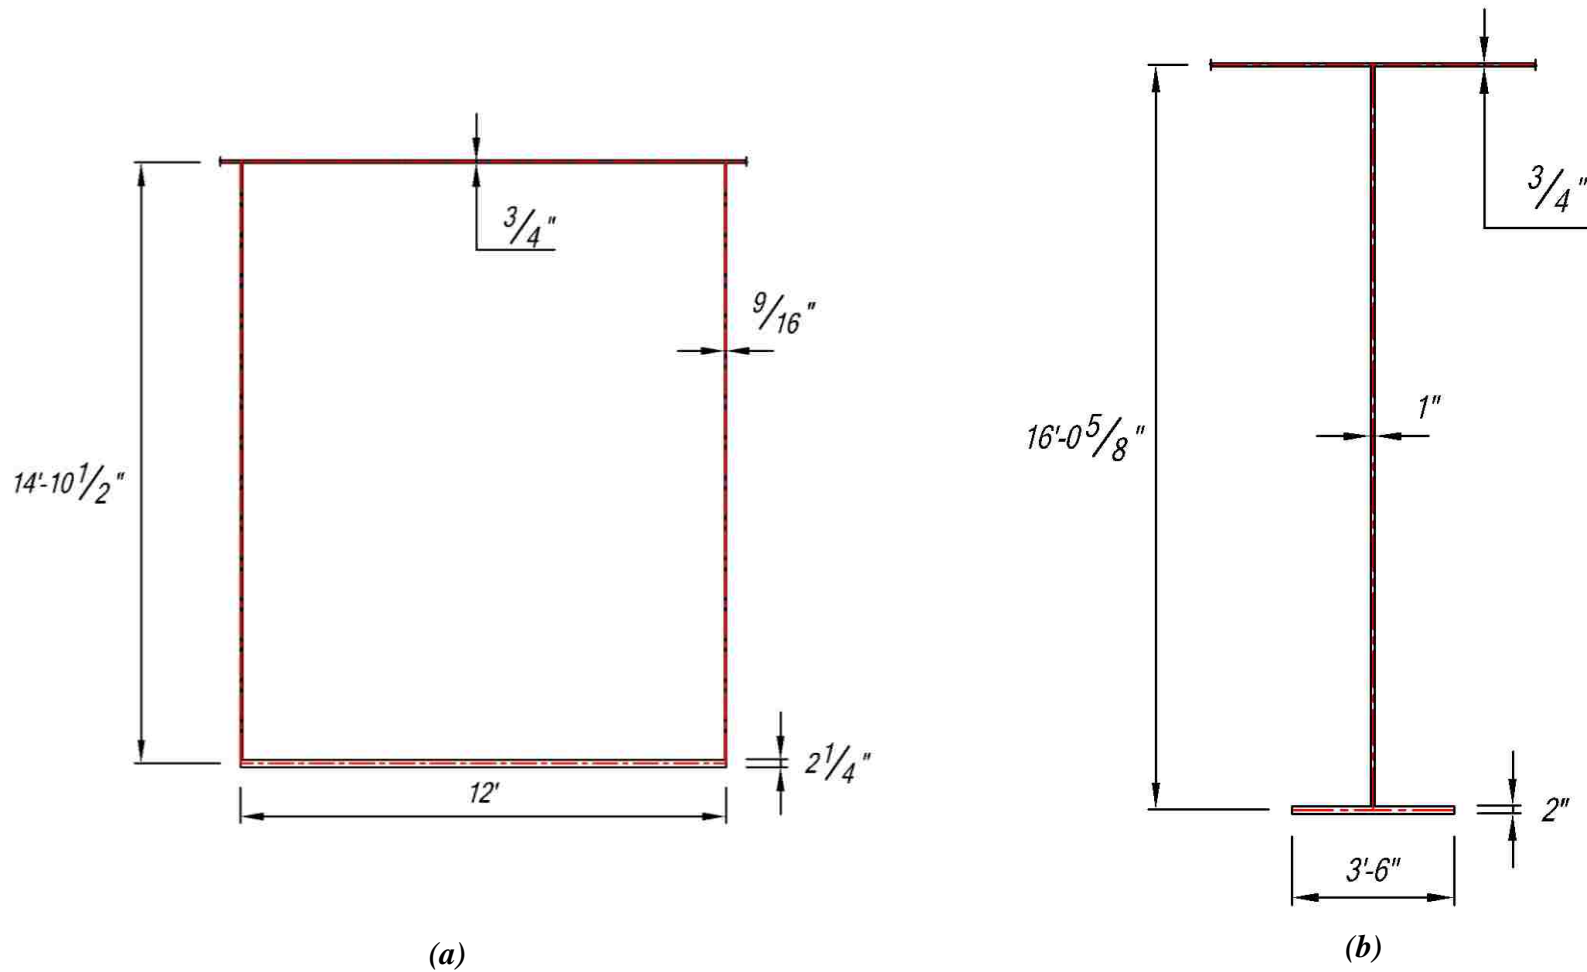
Details of Global Model: (a) Box Girder; (b) End Floor Beam (reproduced from Mukherjee 2016)
